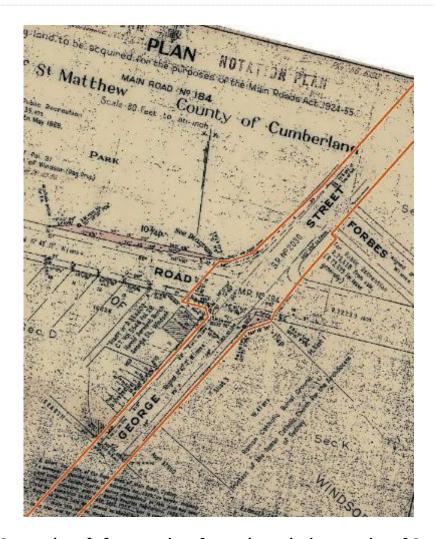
1955 Crown plan of of resumptions for works to the intersection of Goerge Street and Richmond Road, with the study area outlined in orange (Source: NSW Land Registry Services, Crown plan 16015.3000)
